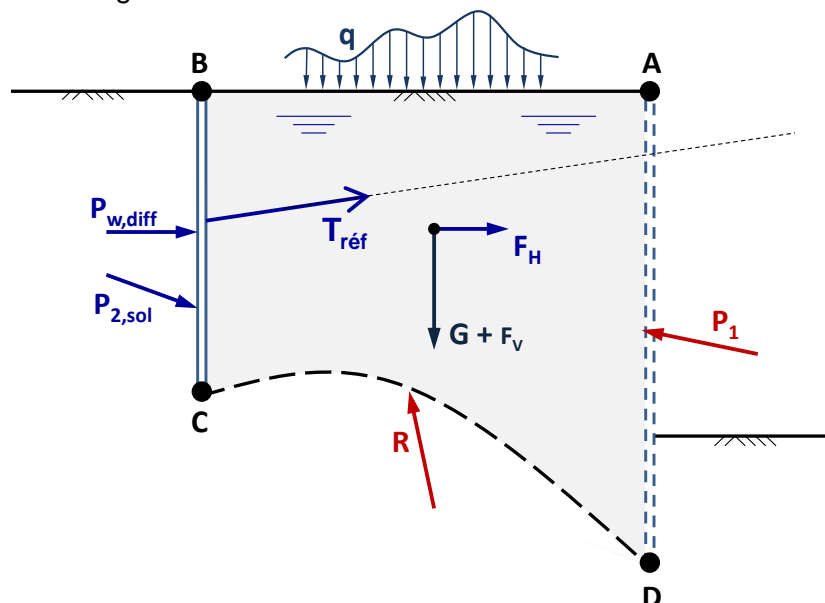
Limit equilibrium of the anchoring block for a double wall project
